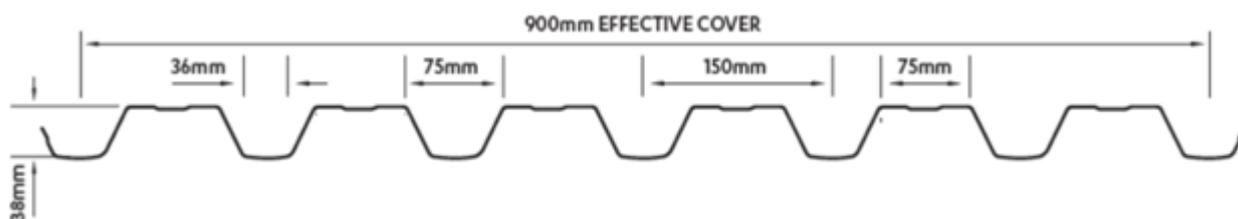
ST900 Profile (Note: Installed inverted as shown)
